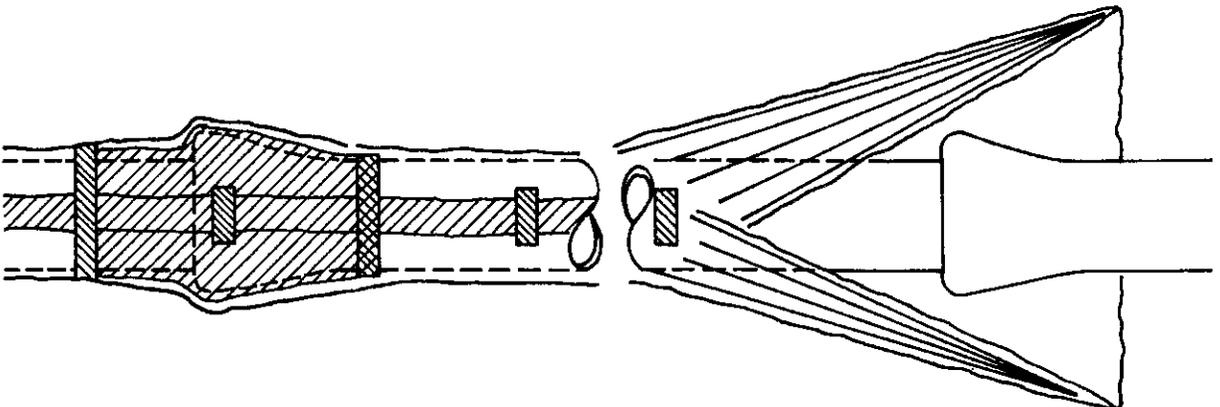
Method C: Pipeline completely wrapped with flat polyethylene sheet.
